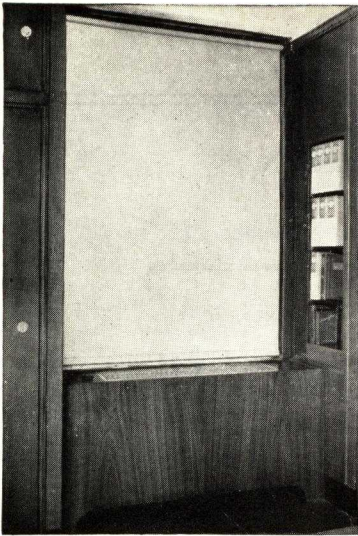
Another typical Type "M" installation. Note center horizontal friction pivot, ventilators and full glass panel door
